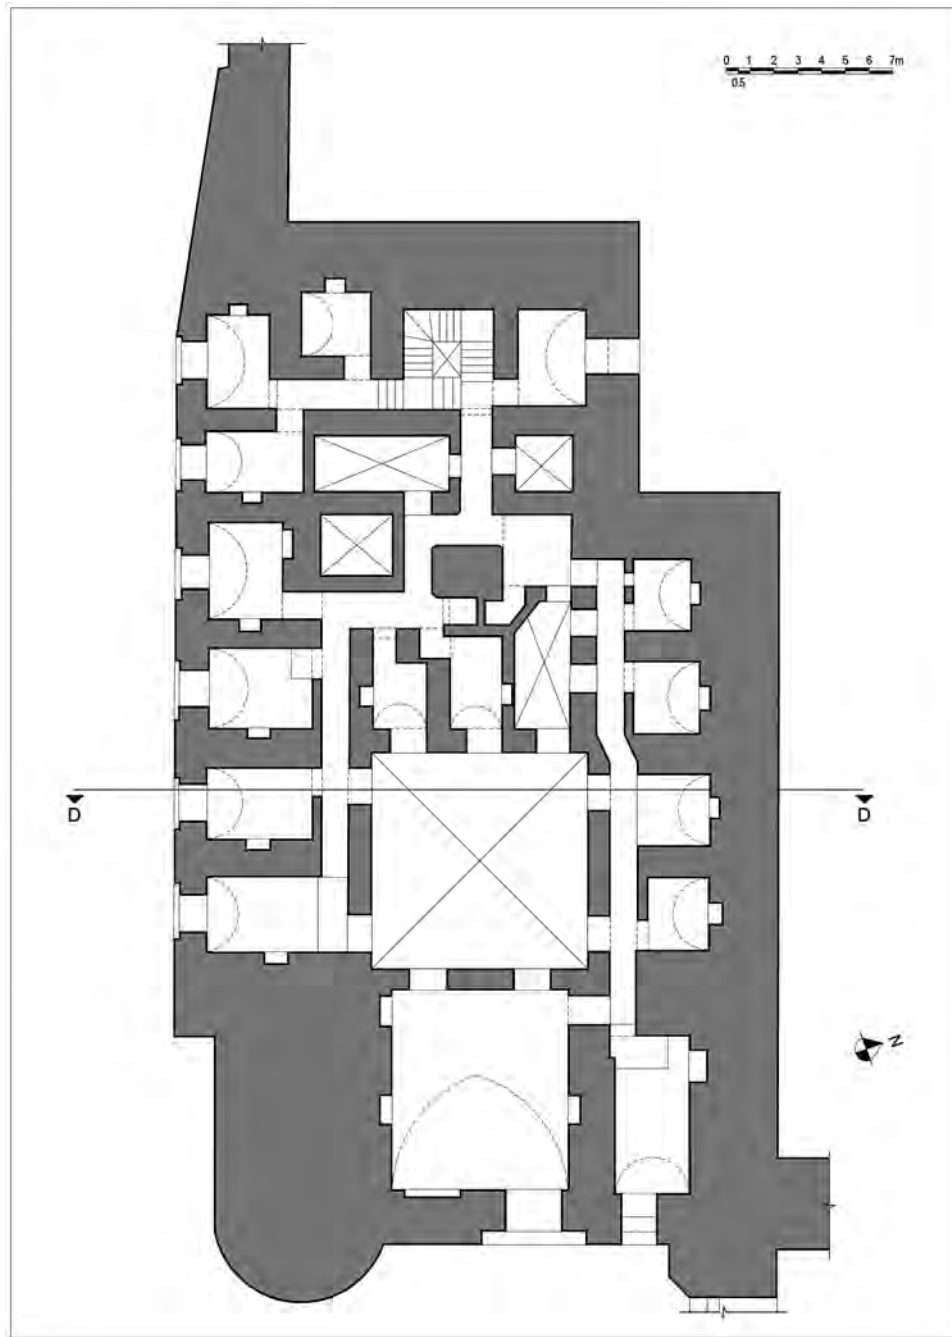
Ḥanafiyah Madrasah, Complex of Sultan Ḥasan, Cairo, third floor plan (H. Al-Harithy)
